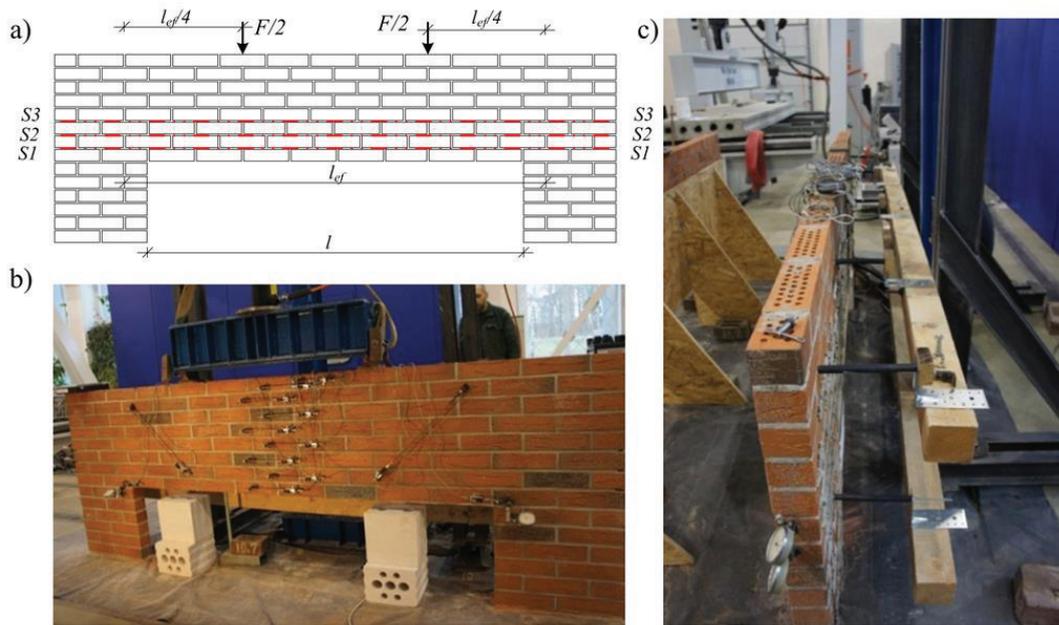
Scheme for testing a masonry lintel: (a) loading scheme, (b) general view of arranged equipment, (c) solution of constraining the out of plane deformations of the lintel with flexible ties.
